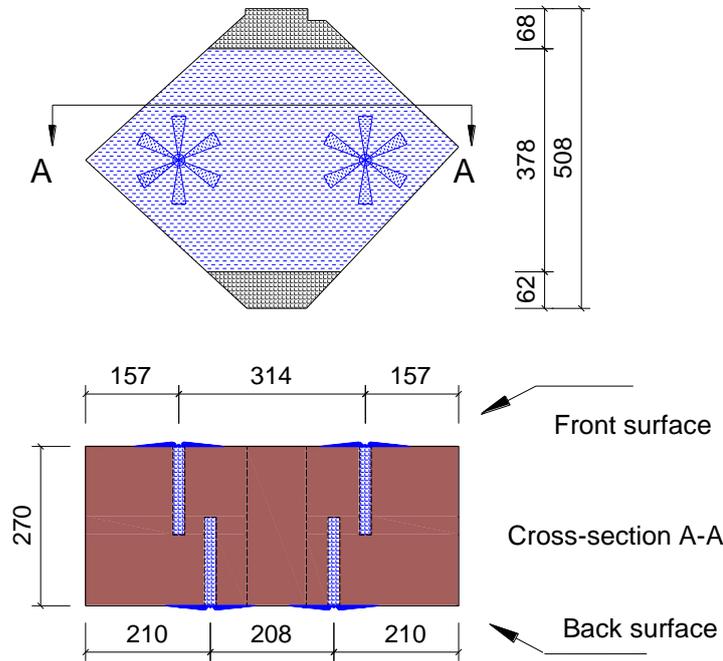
Type D specimen with FRP sheets anchored into the bricks, (units in mm)
